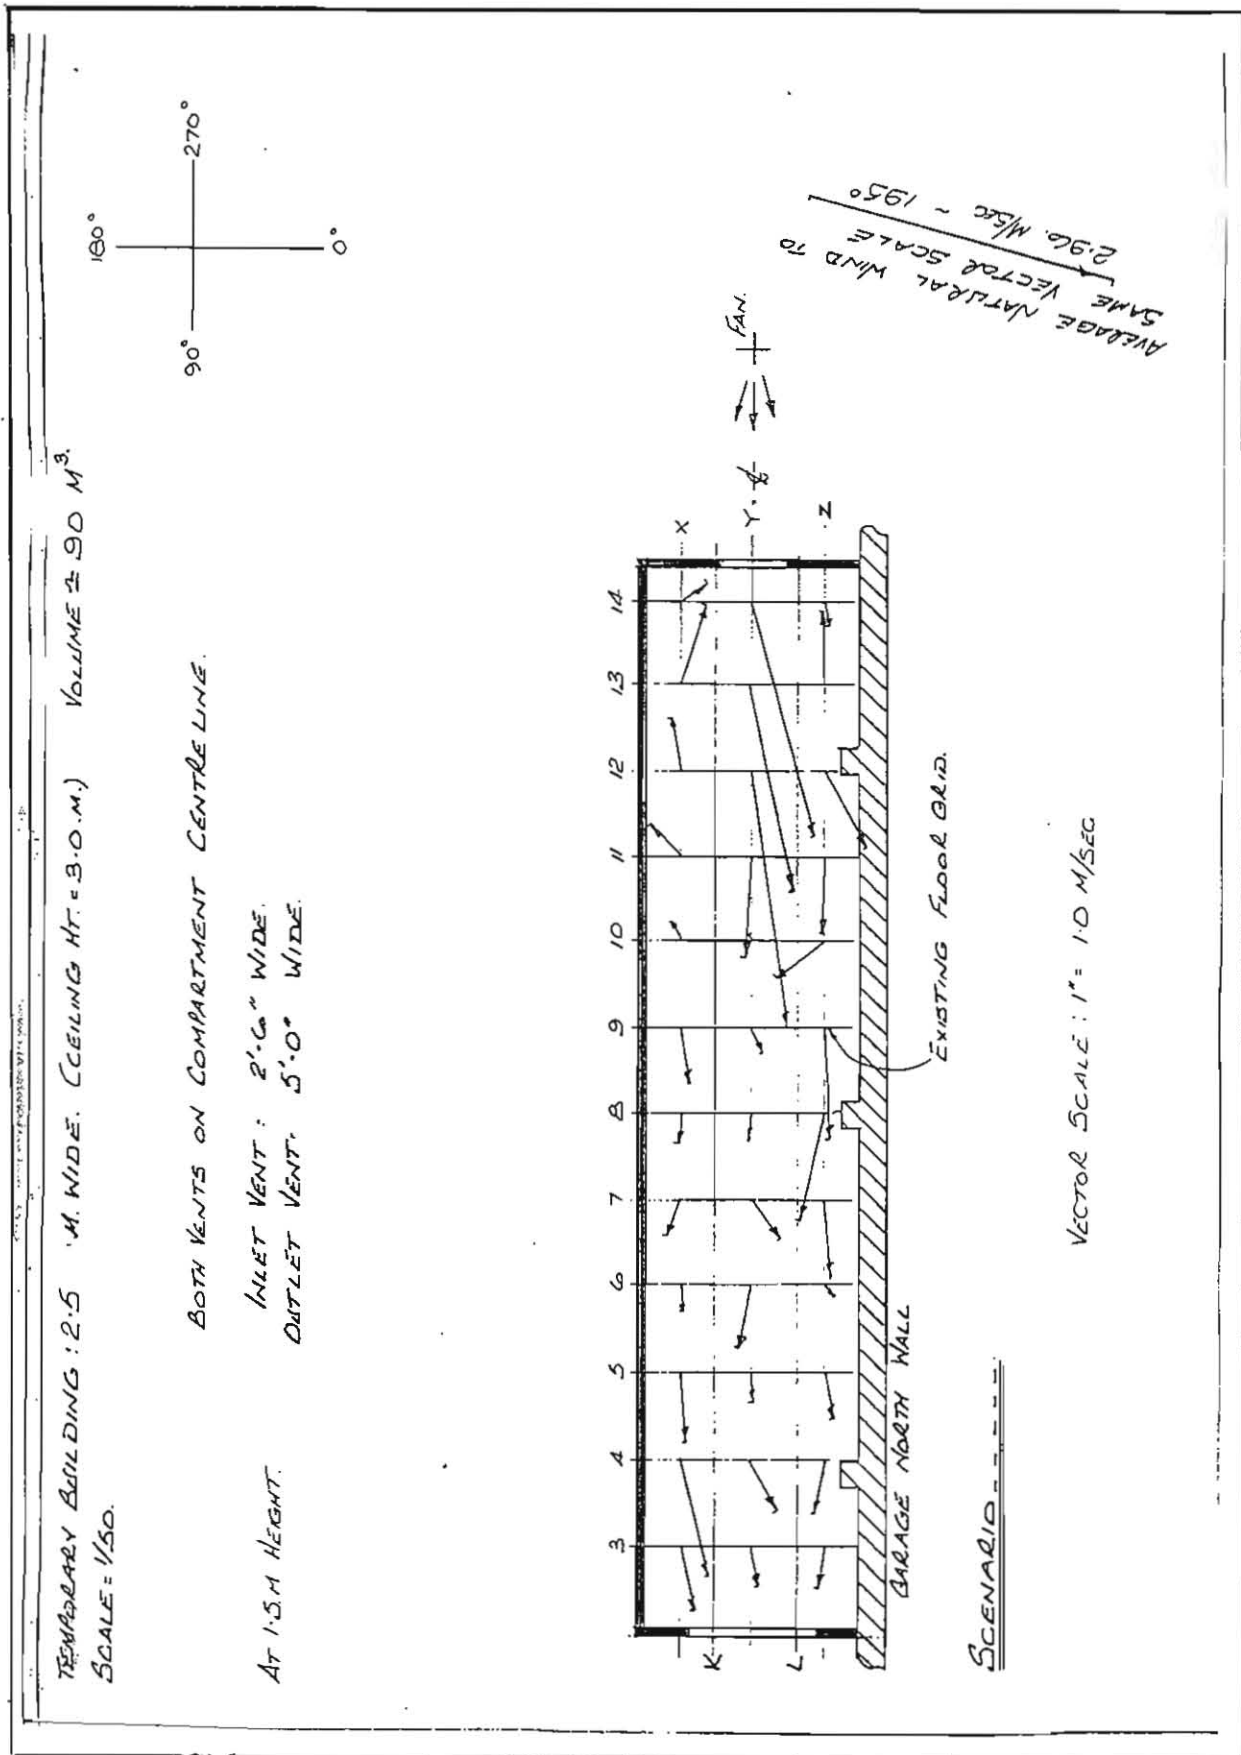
Airflow survey in 2.5 metres wide compartment: 2' 6" inlet - 5' 0" outlet.
